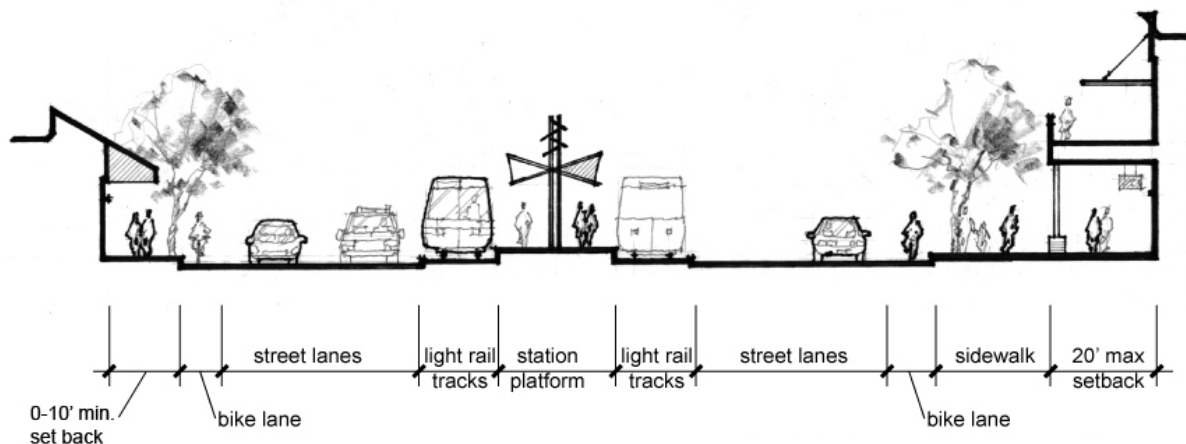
B. Transportation Overlay District Cross Section of Typical Street
